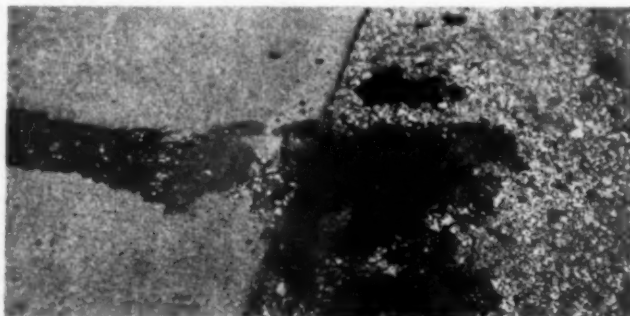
Mixture Just Blowing Out at End of a Crack
